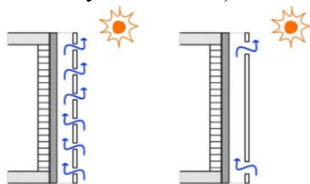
Open joints ventilated façade (left) and closed joints (right) (Ibañez-Puy et al., 2017).
